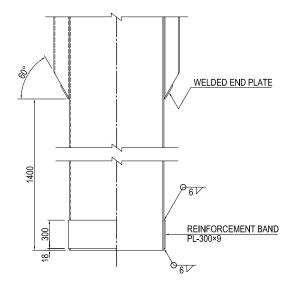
DETAIL OF IN-SITU LONGITUDINAL WELDING PART S=1:40
